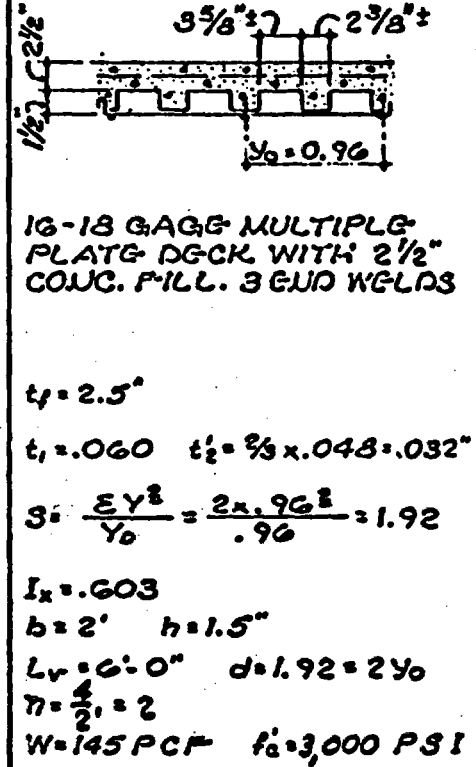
Steel Deck Diaphragms - Sample Calculation
